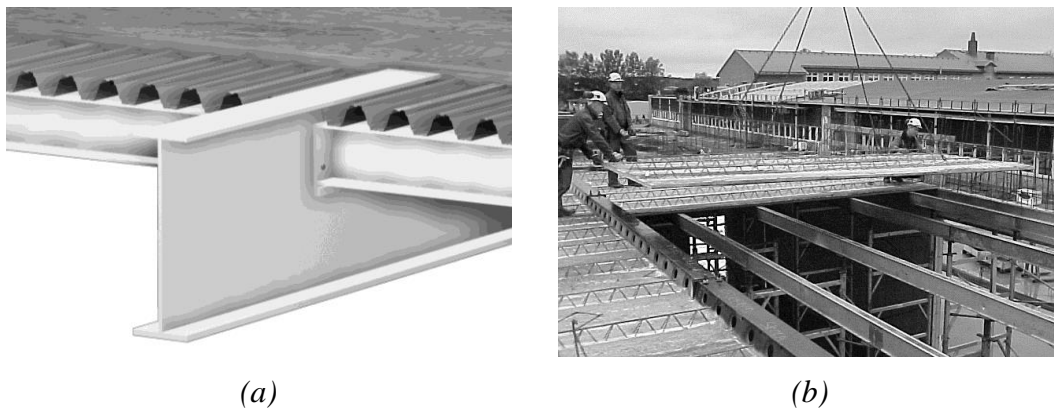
Composite floors: (a) steel deck, steel beams, and in-situ concrete (visualisation Wille Karlsson); and (b) precast elements (lattice girder elements), steel beams, and in-situ concrete. (Photo by Hans Olsson).
